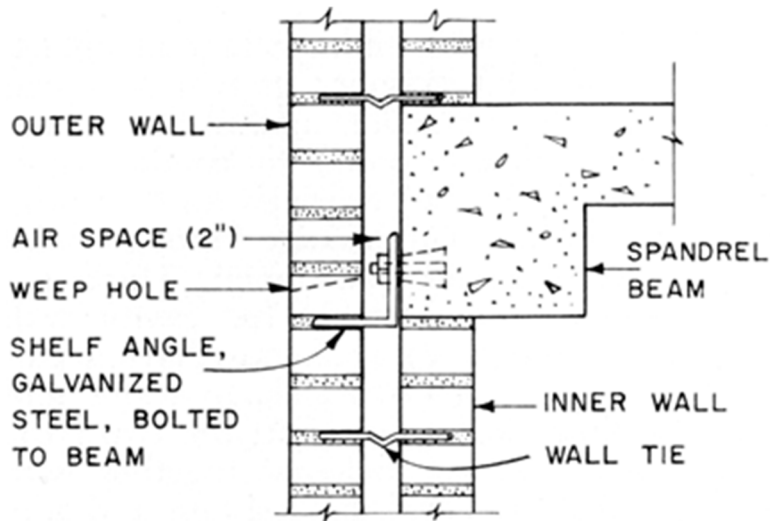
Typical Arrangement of Cavity Wall at a Spandrel Beam.
